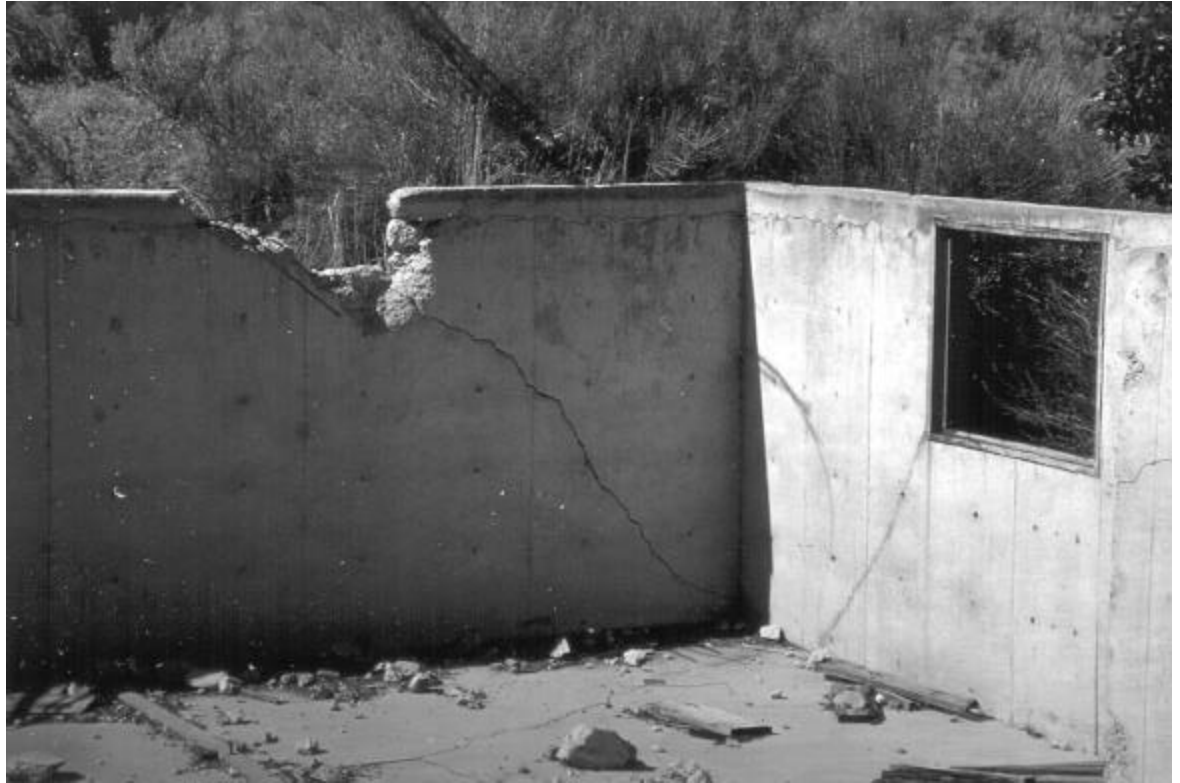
Basement of demolished house severely damaged by collapsible soils. Note the cracked walls and floor slab.
